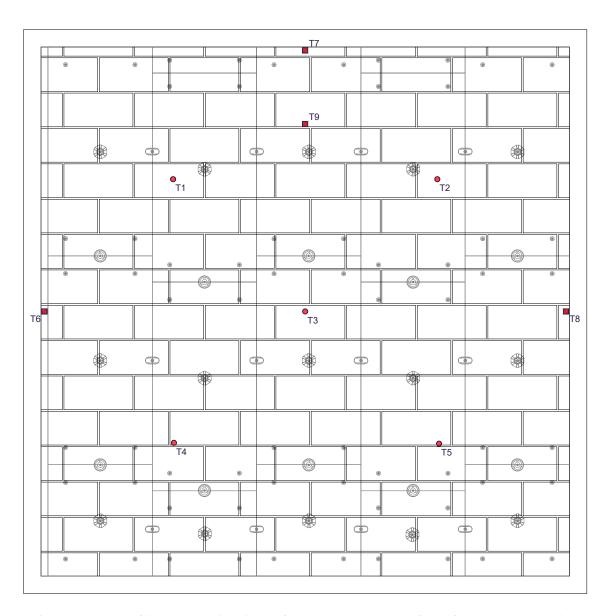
Layout of instrumentation viewed from the unexposed surface of the test construction
